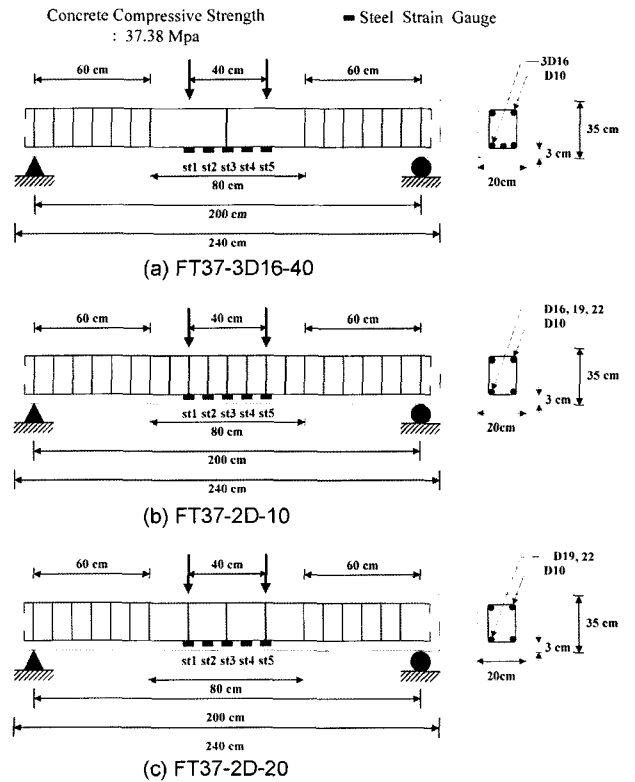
Sectional properties of the specimens (flexural beam, FT37 series)
